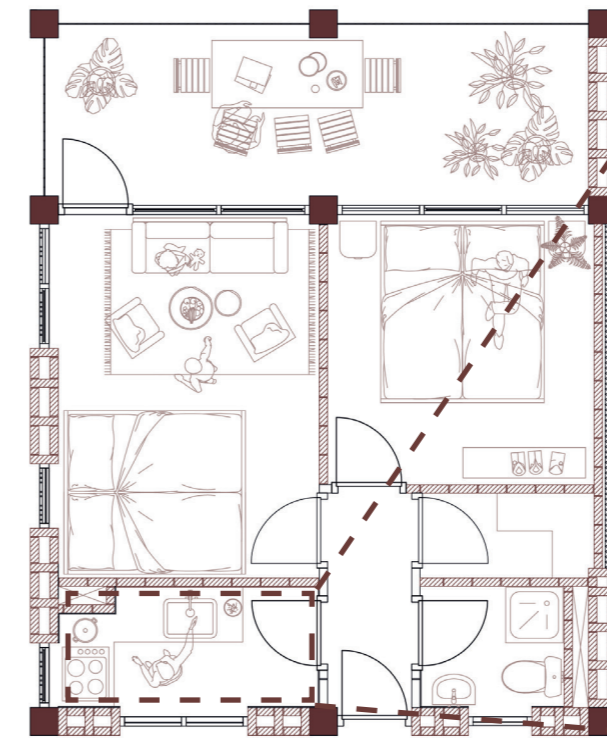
Floorplan of a low-income house on the second floor (own figure).
